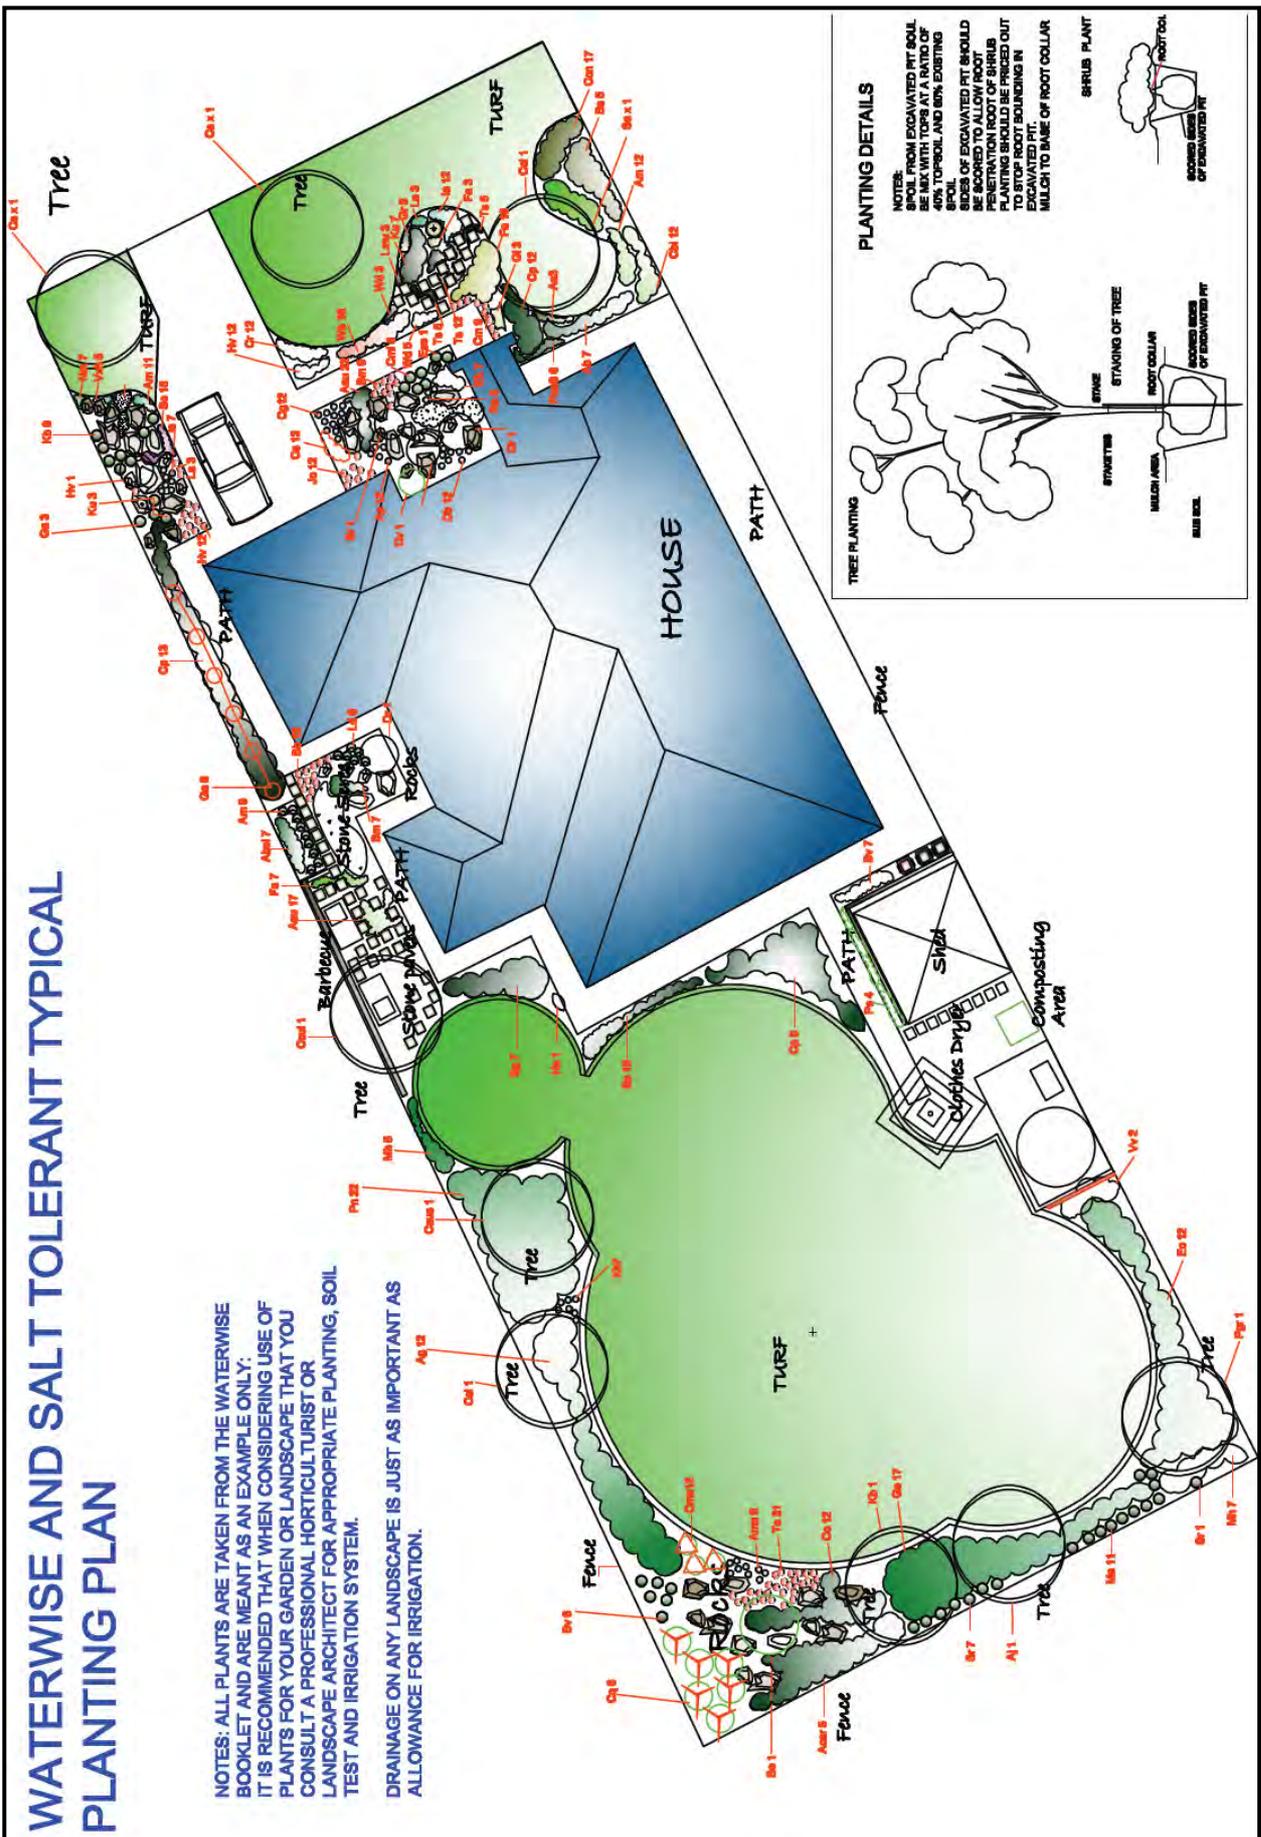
Waterwise and Salt Tolerant Typical Planting Plan
